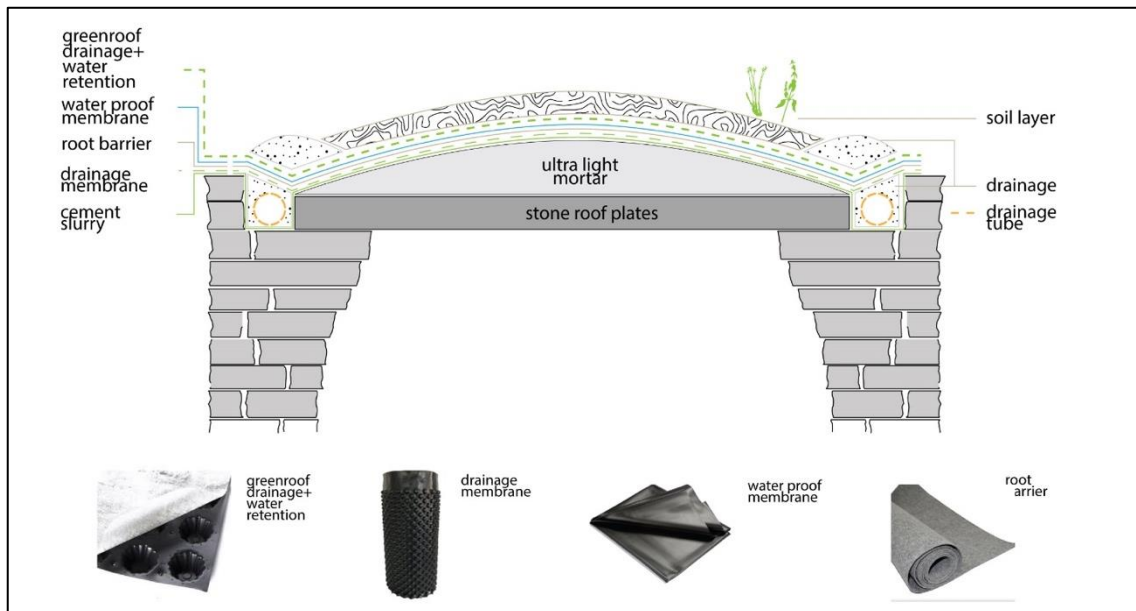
Schematic construction drawing of the green roof installation and materials
